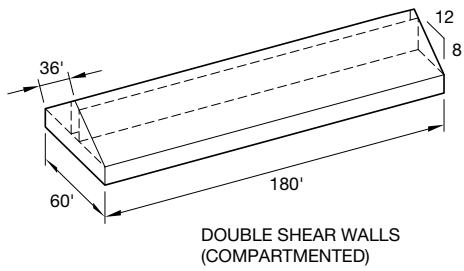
D – Attic Sprinklers with Standard Sprinklers
